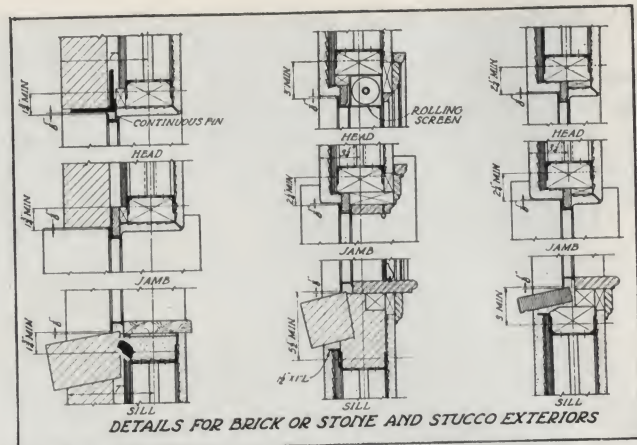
Typical Window Details for Steel Sash Showing Methods of Blocking to Steel Frame
